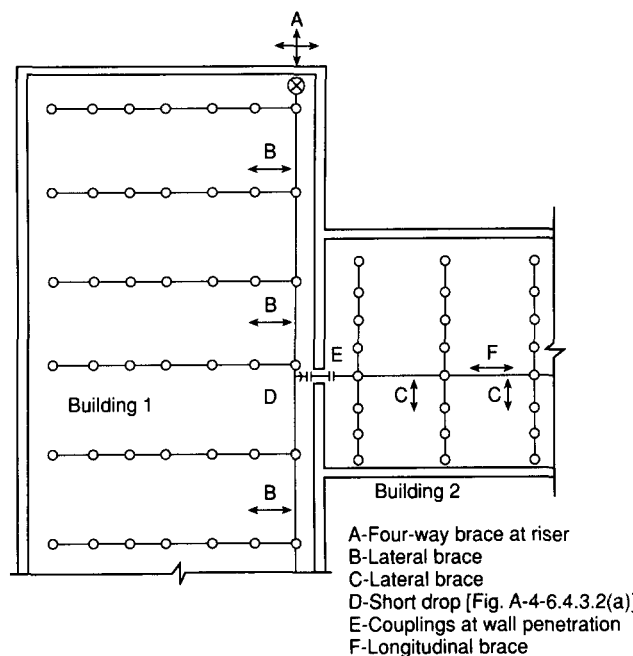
(a) Earthquake protection for sprinkler piping.
